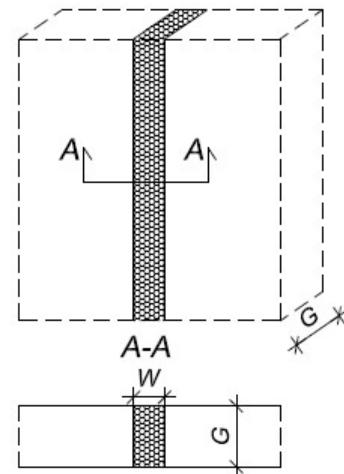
View and cross-section of the vertical linear joint seal in wall
